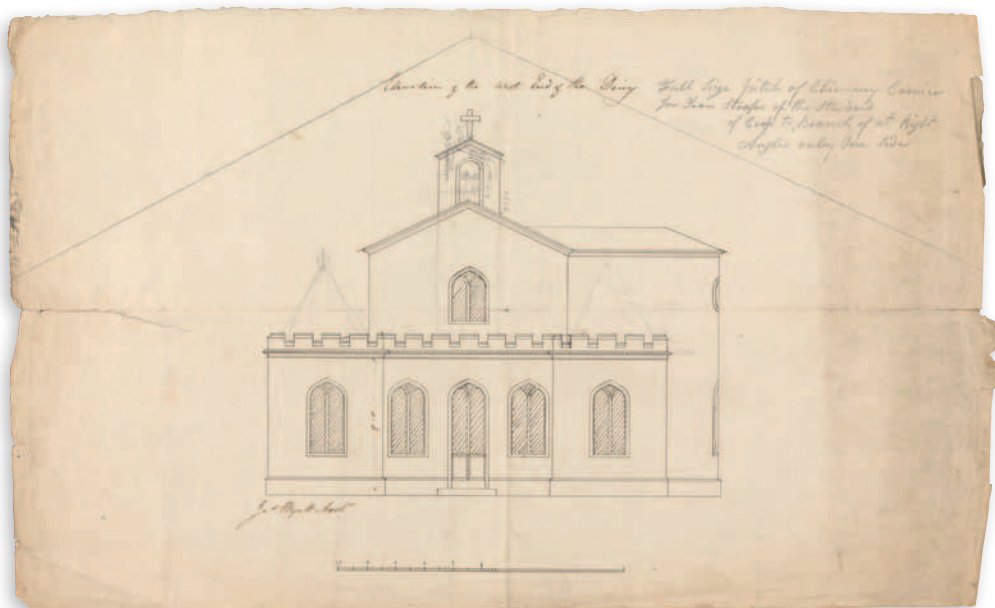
'Elevation of the West End of the Dairy.' At this stage a full-height 'apse' is proposed to the rear (unexecuted). The first suggestions of the pyramidal corner roofs are lightly sketched in pencil. (Yale Center for British Art, Paul Mellon Collection, B1977.14.798)
